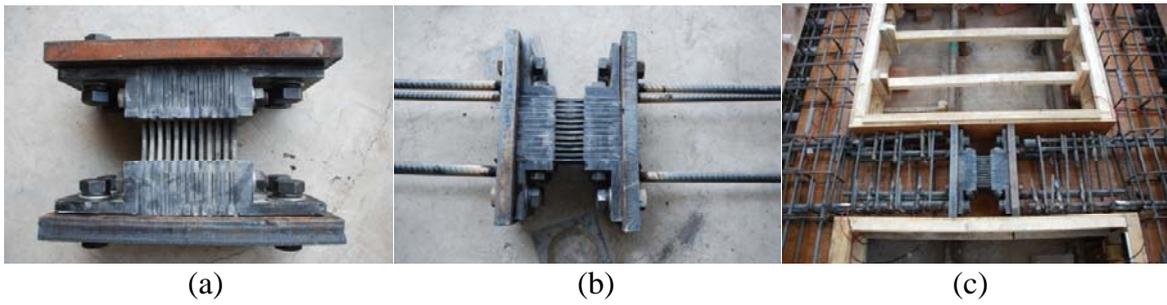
Installation: (a) Sample damper; (b) Anchor rebars; (c) Installation in the framework
